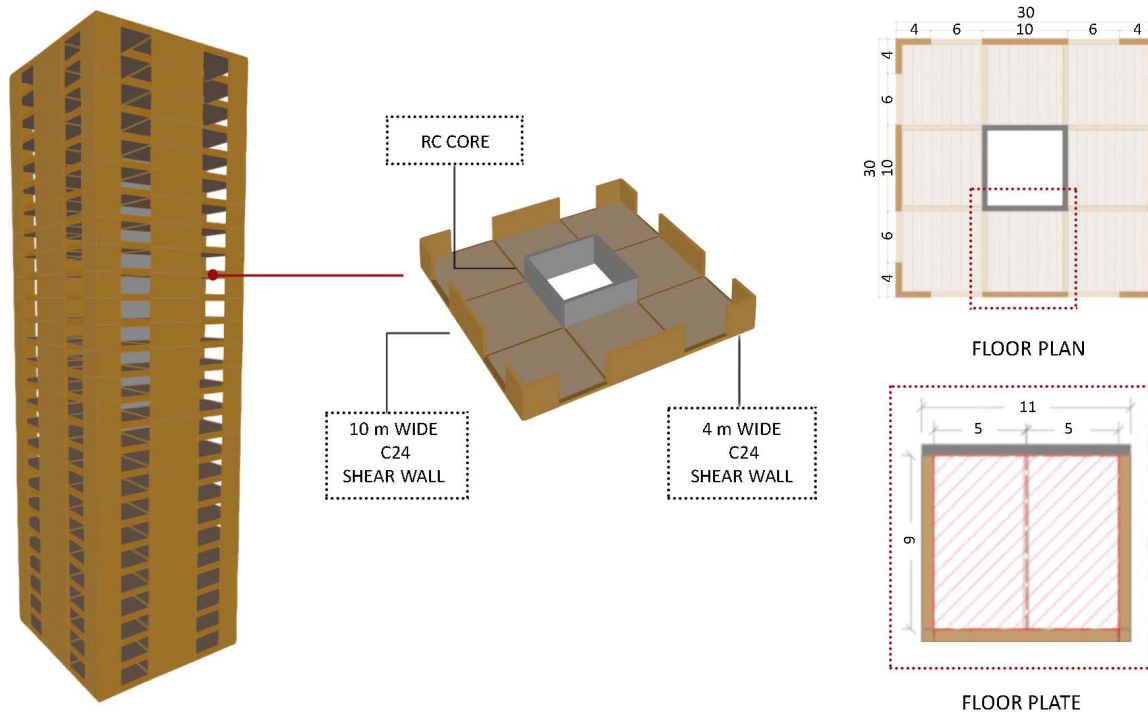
Schematic of the shear-walled variant and typical floor plan.
